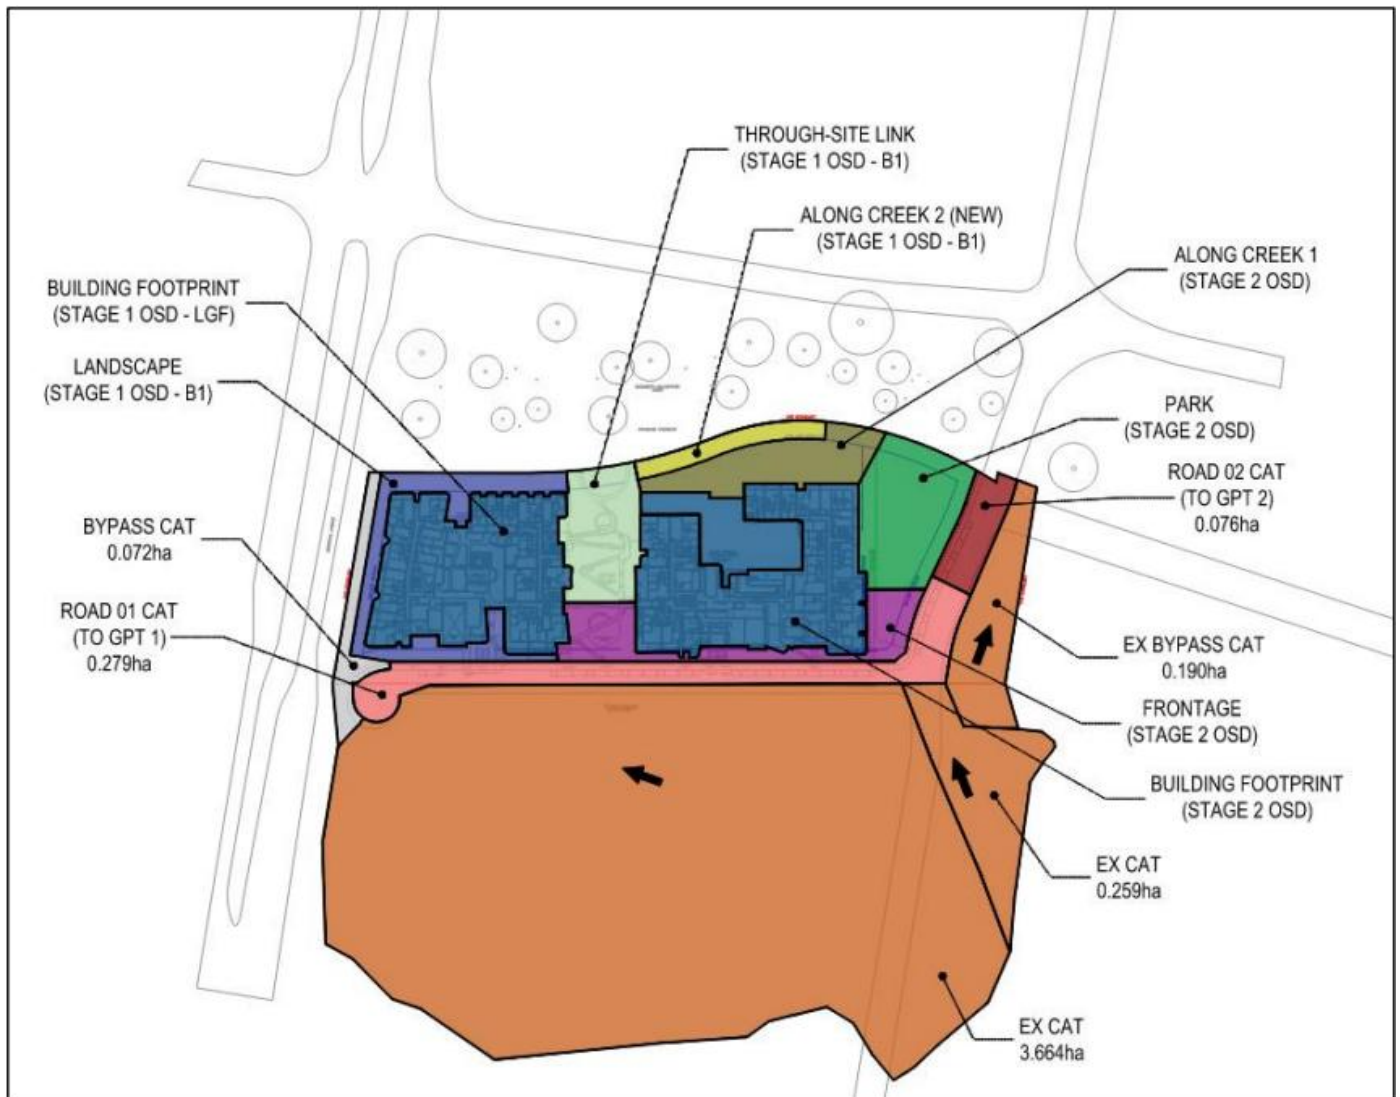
Proposed Catchment Plan. Source: EI Consulting Engineers
